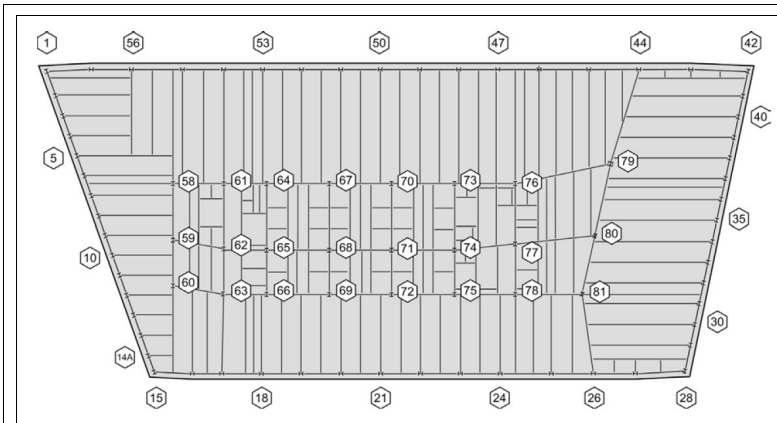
Typical floor plan of WTC7, from the 7th to the 47th story. (Source [36]).
